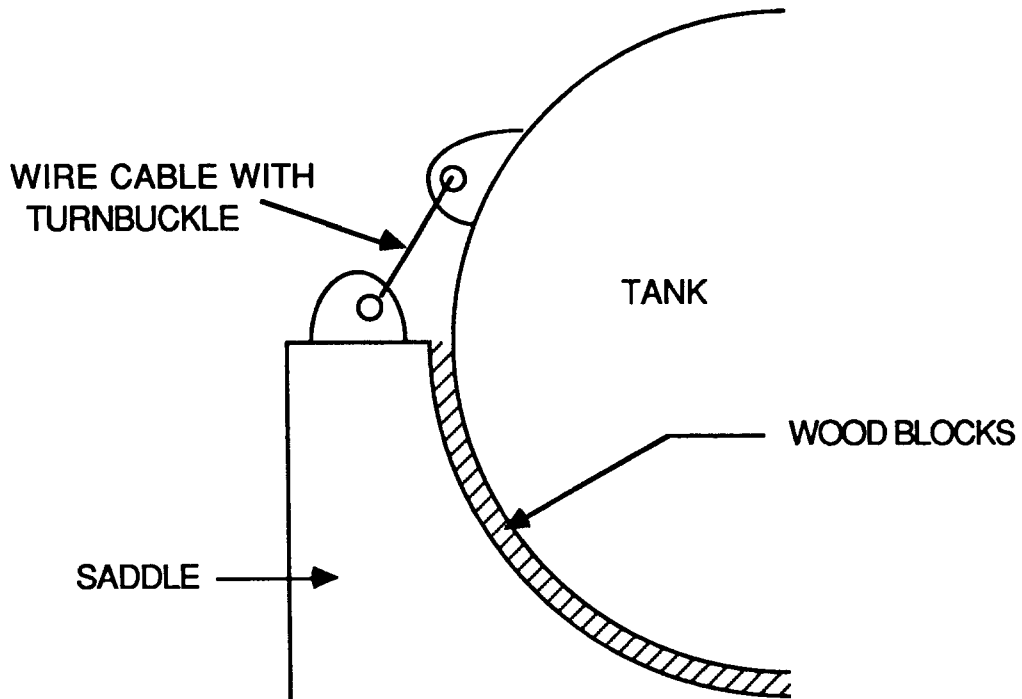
B - WOOD MOUNTING BLOCK INSTALLATION. ALSO SHOWS TYPICAL METHOD OF HOLDING TANK IN SADDLE (END VIEW)
